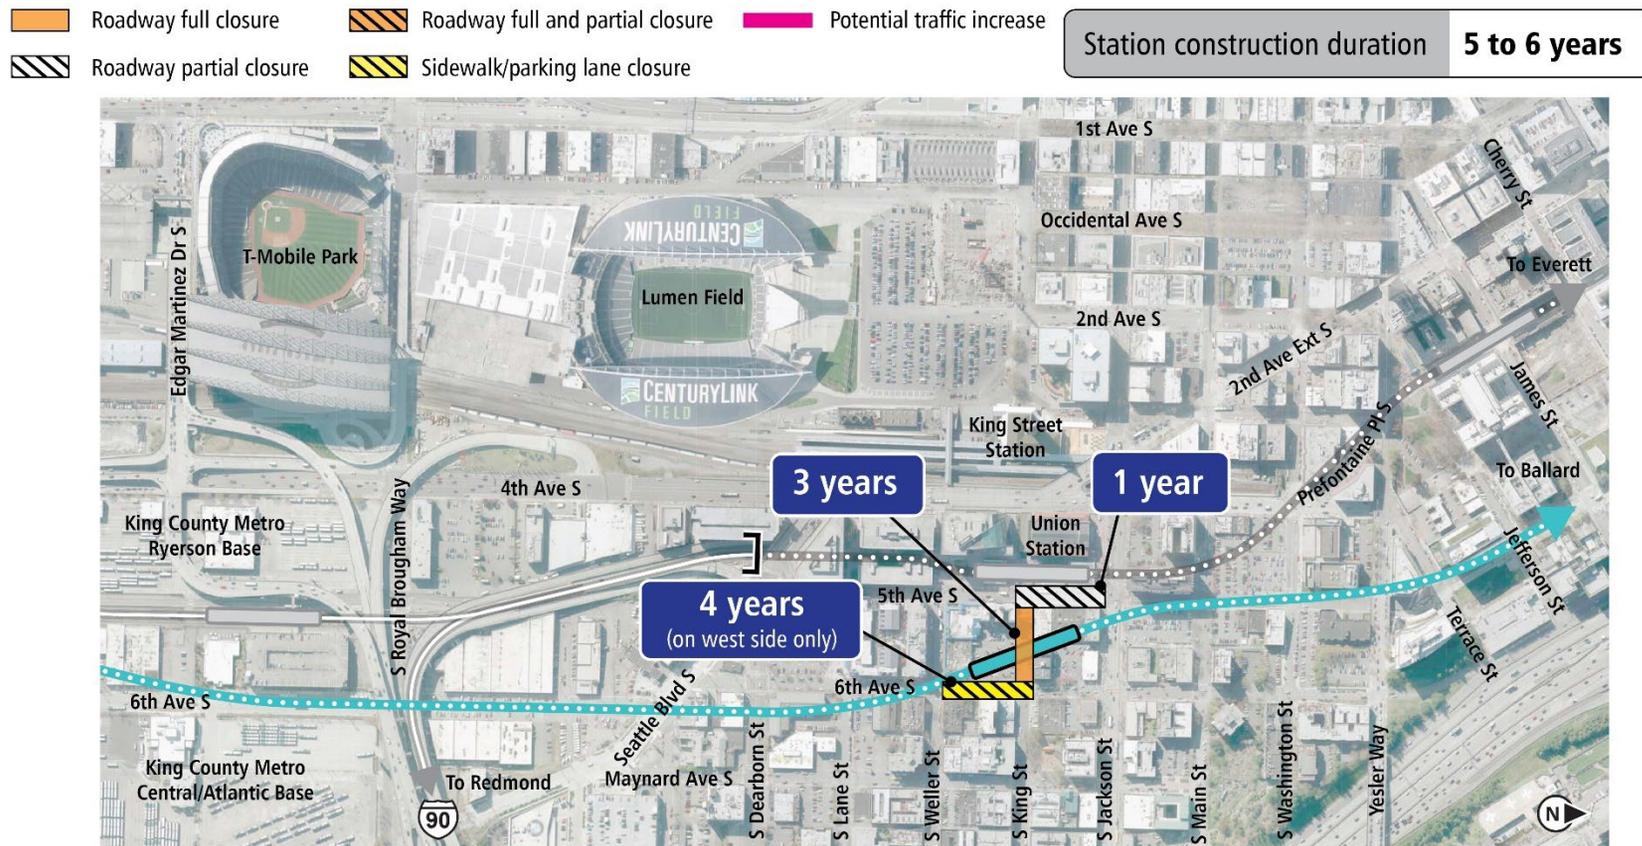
Construction roadway closures and potential detour routes for 5th Avenue Shallow Alternative (CID-2a)
